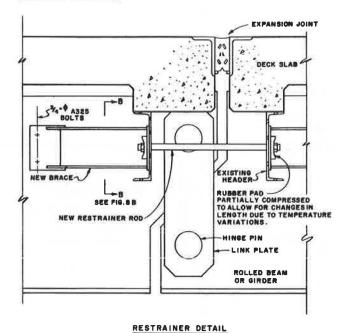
Steel girder hinge expansion joint longitudinal restrainer retrofit concept.
